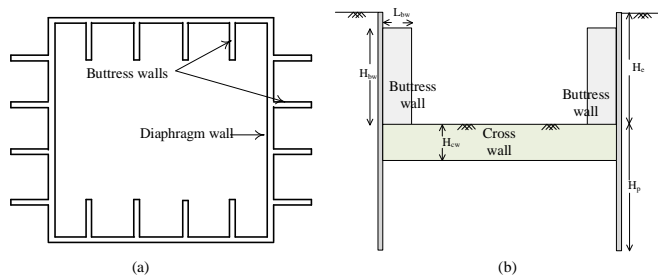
Locations of buttress walls (b) Combination of Cross and buttress walls
